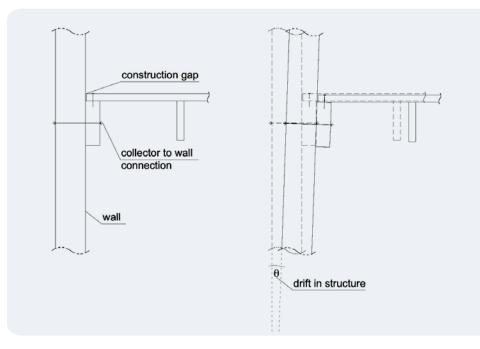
Construction gap between the floor and the wall to allow for rotation: a) undeformed state; b) deformed state.
